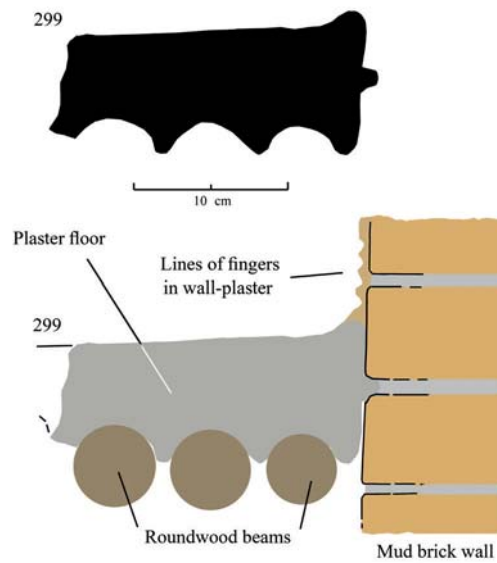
Fragment 299 showing the ground floor and to the side impressions of the mud-brick house wall.
